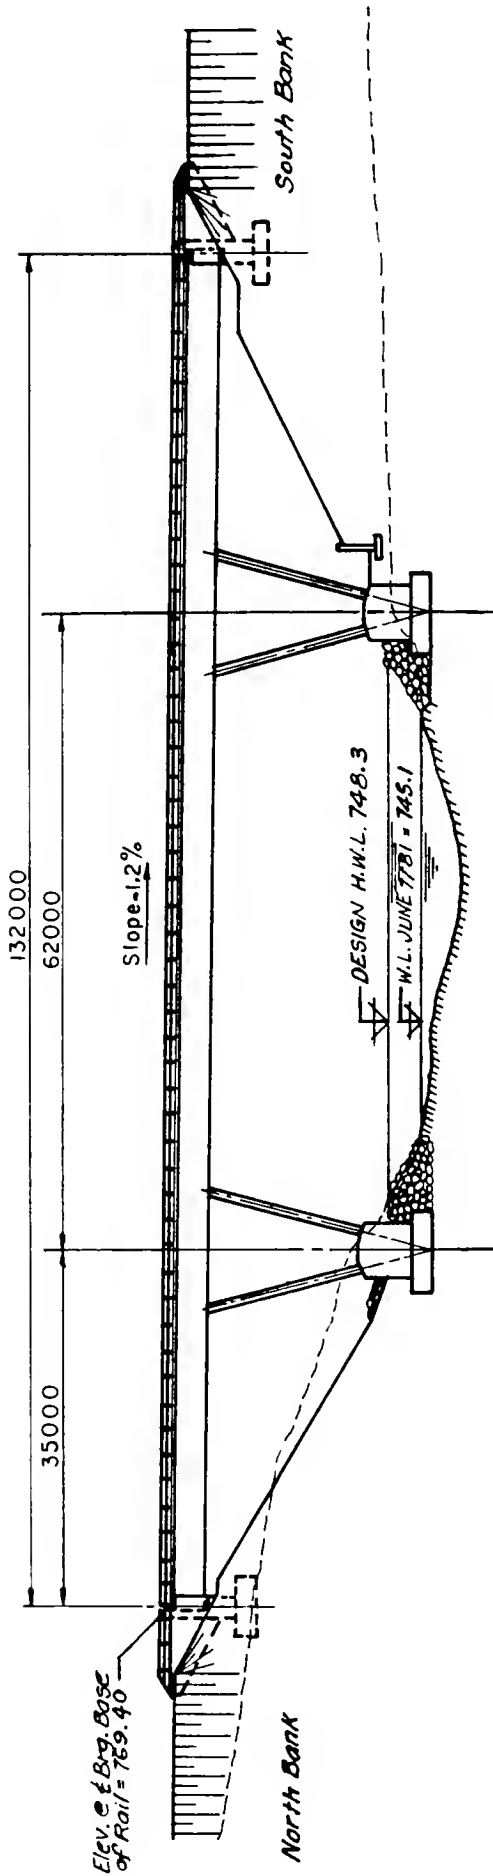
ELEVATION - WOLVERINE RIVER BRIDGE
